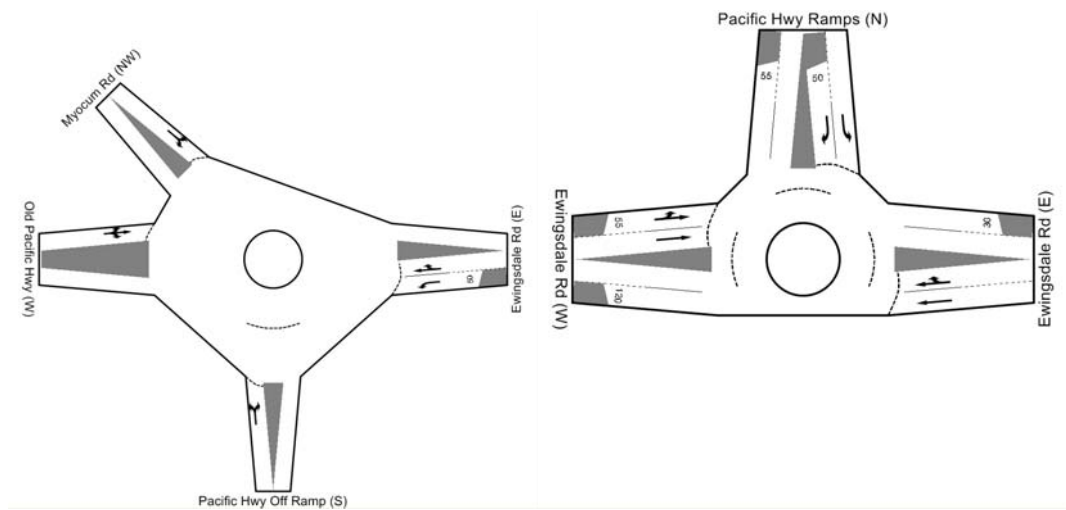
Upgraded highway + new western roundabout and existing ramps (2)
